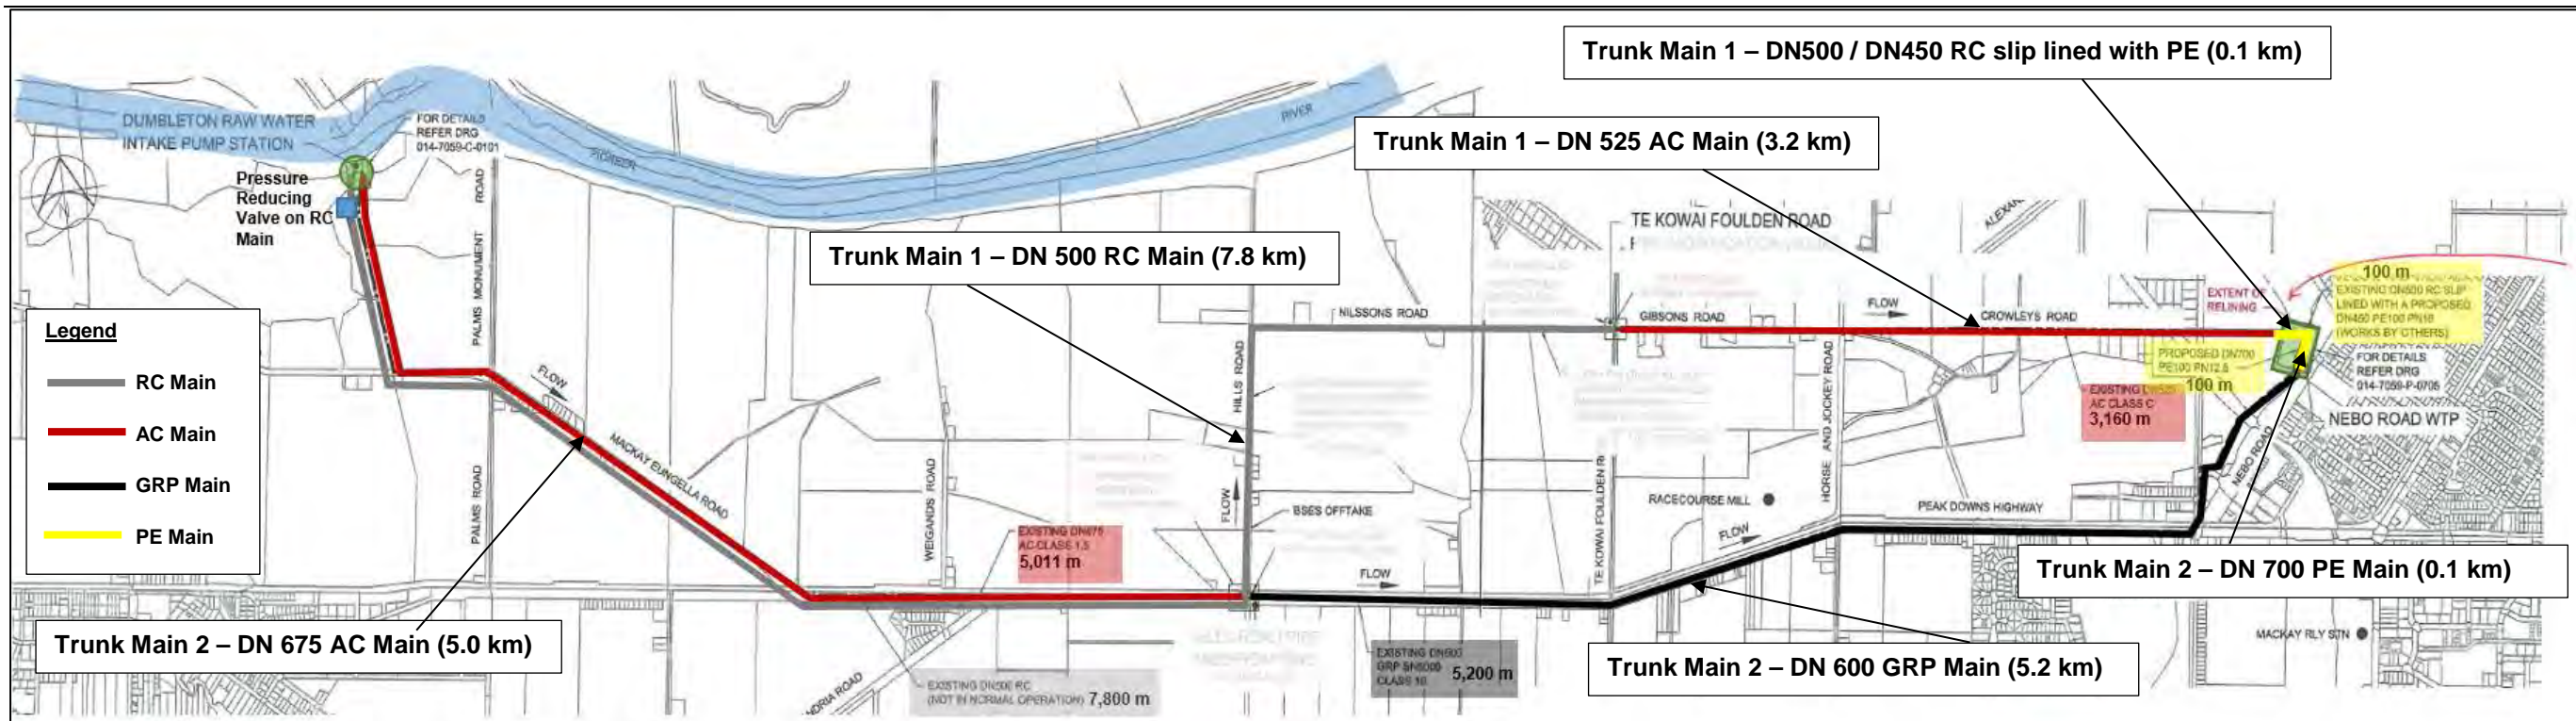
Existing Dumbleton Raw Water Trunk Mains
